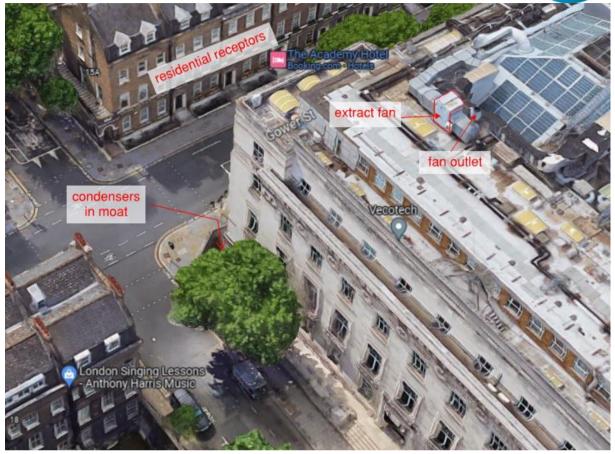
Location of Roof and Moat Plant (google maps image view from SE)
